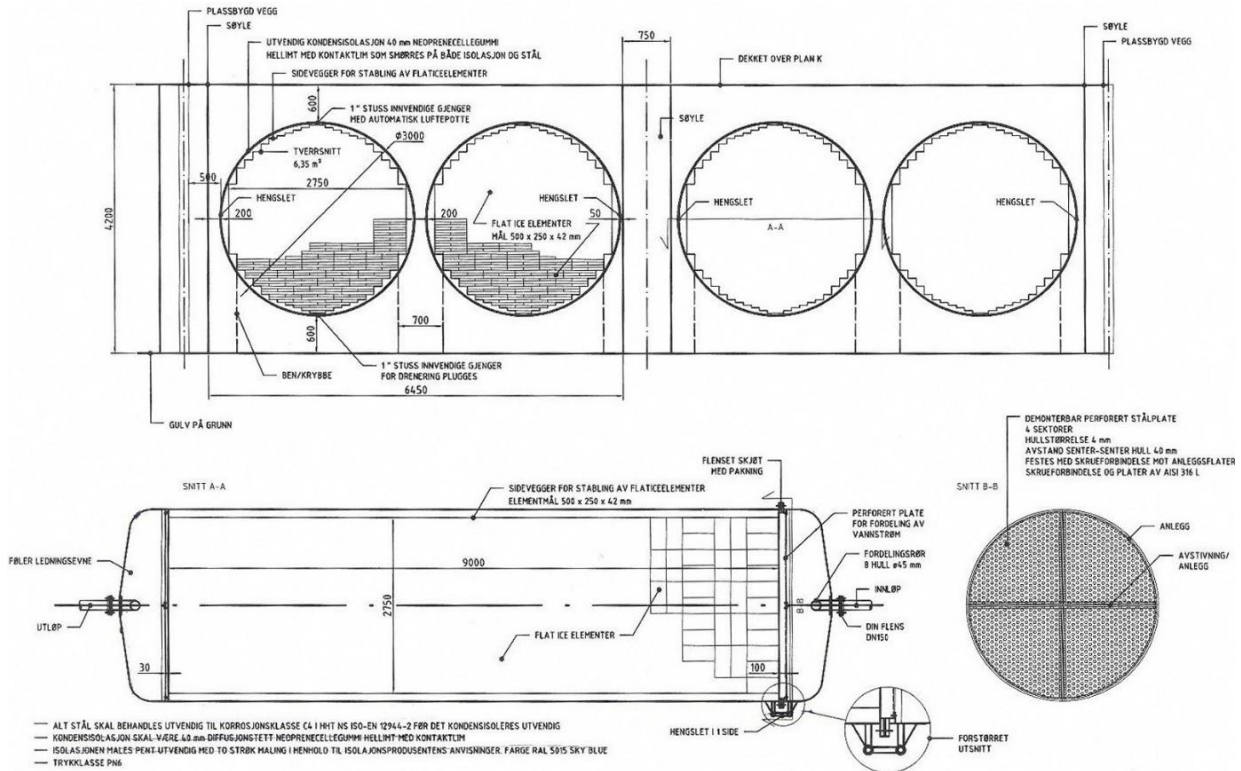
Engineering drawing for the PCM cold storage tank (Sweco2014)
